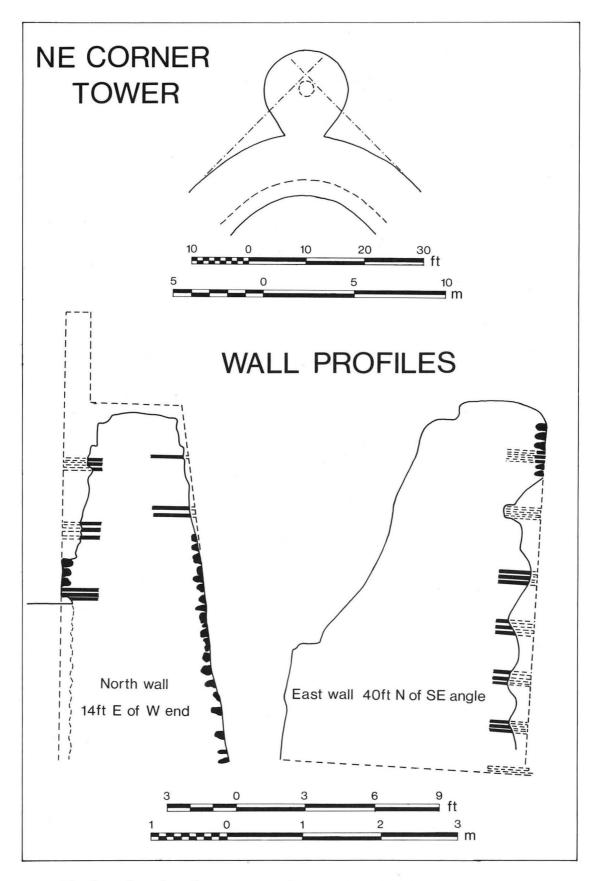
Plan of north-east corner tower and profiles through fort wall. Scale 1:50.
